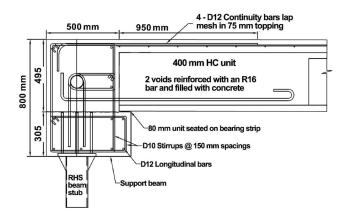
Recommended connection detail for 400 HC from NZS 3101:2006 (ref. 13).
